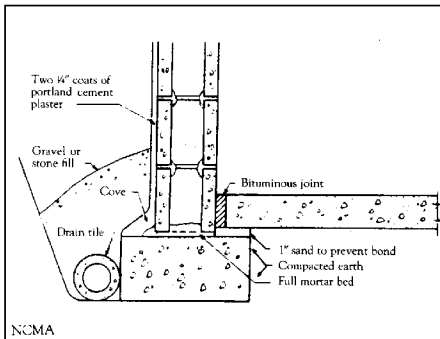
At the bottom of the wall, form the mortar into a cove to shed water from the footing/wall joint.
